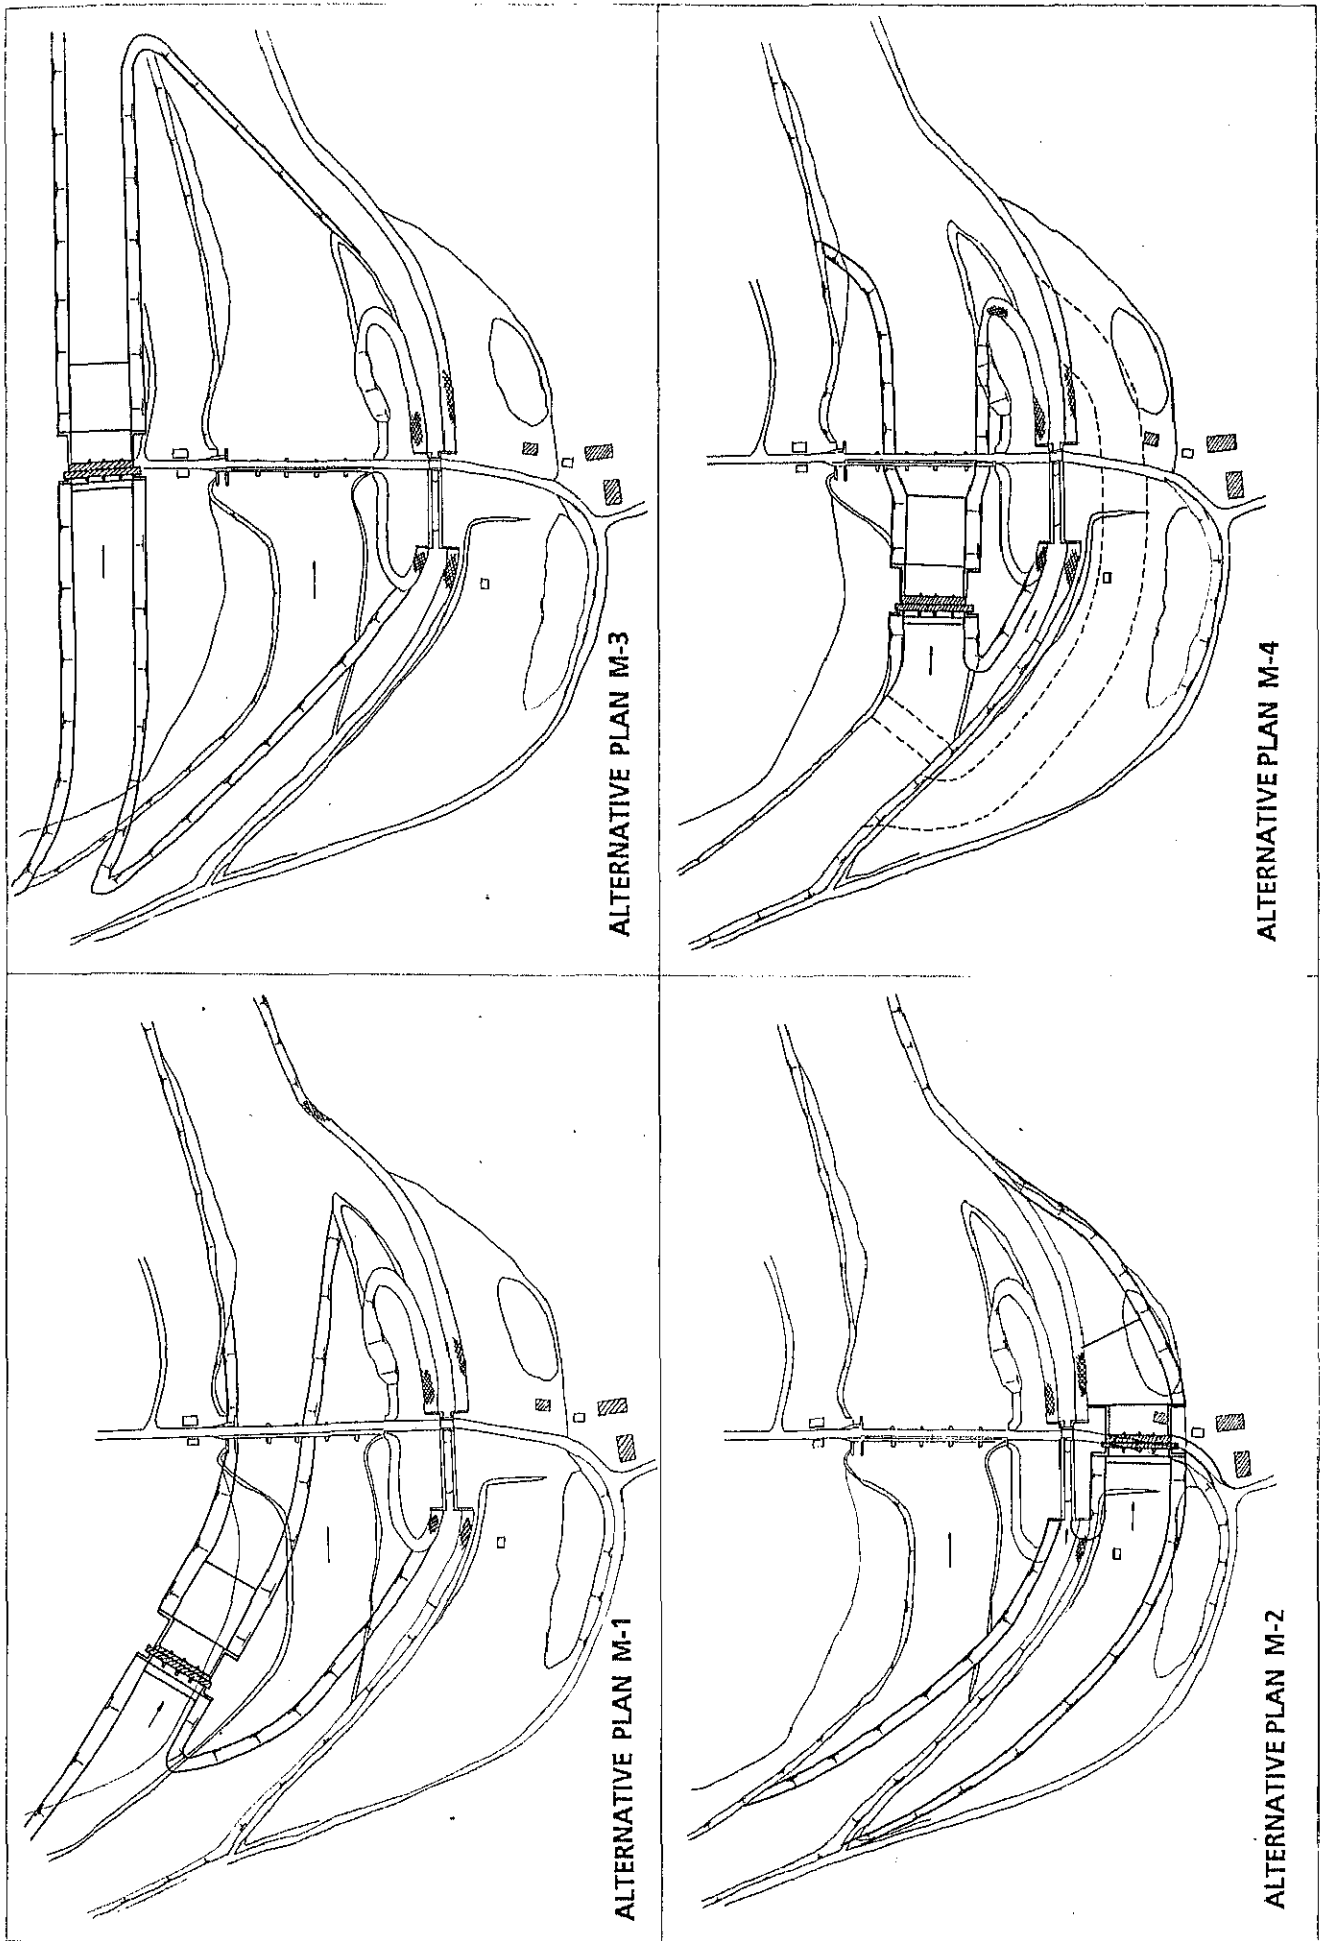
Alternative Plan of Proposed Site (Lahoun Regulator)
